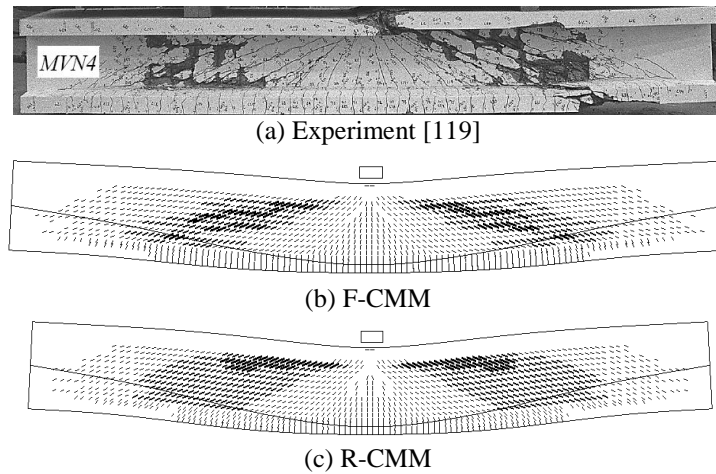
Beam MVN4: cracking patterns at failure.
